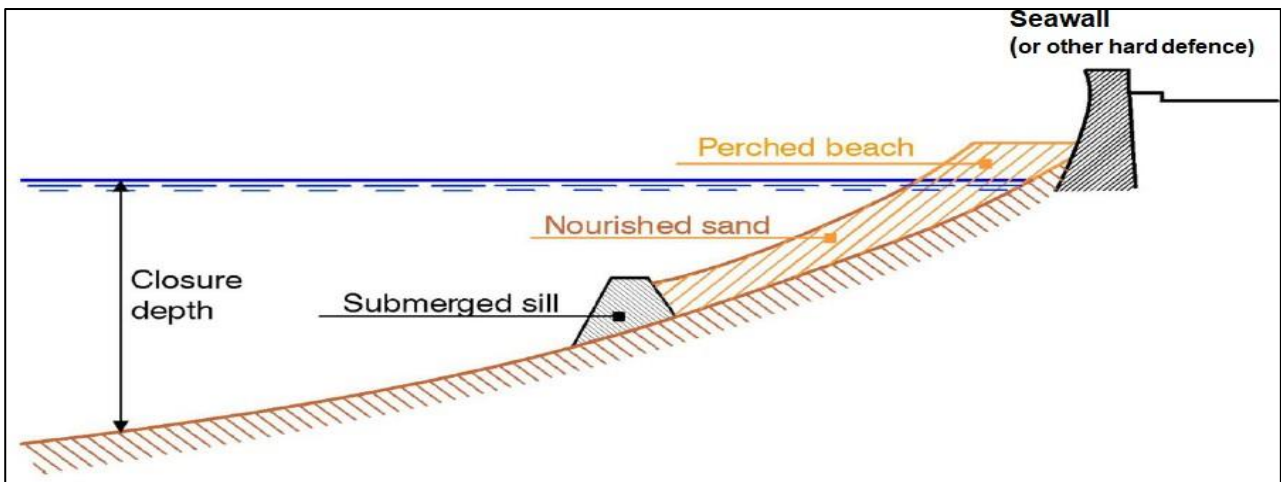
A typical section of a perched beach consisting of a beach fill supported by a submerged sill (DHI 2017)
